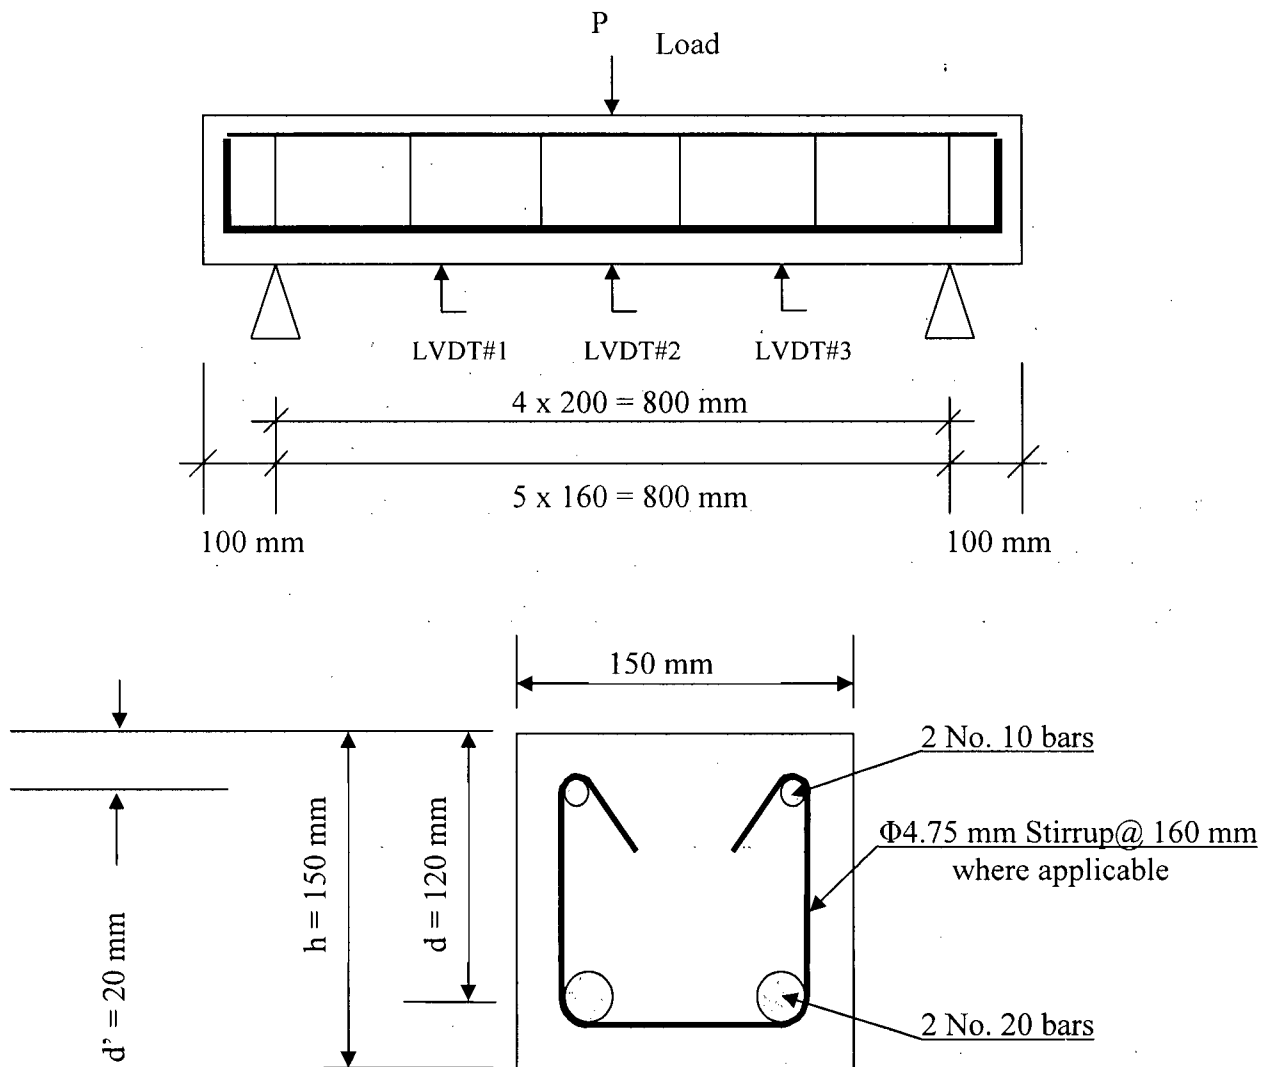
Load Configuration and Cross-Sectional Details of RC Beams
